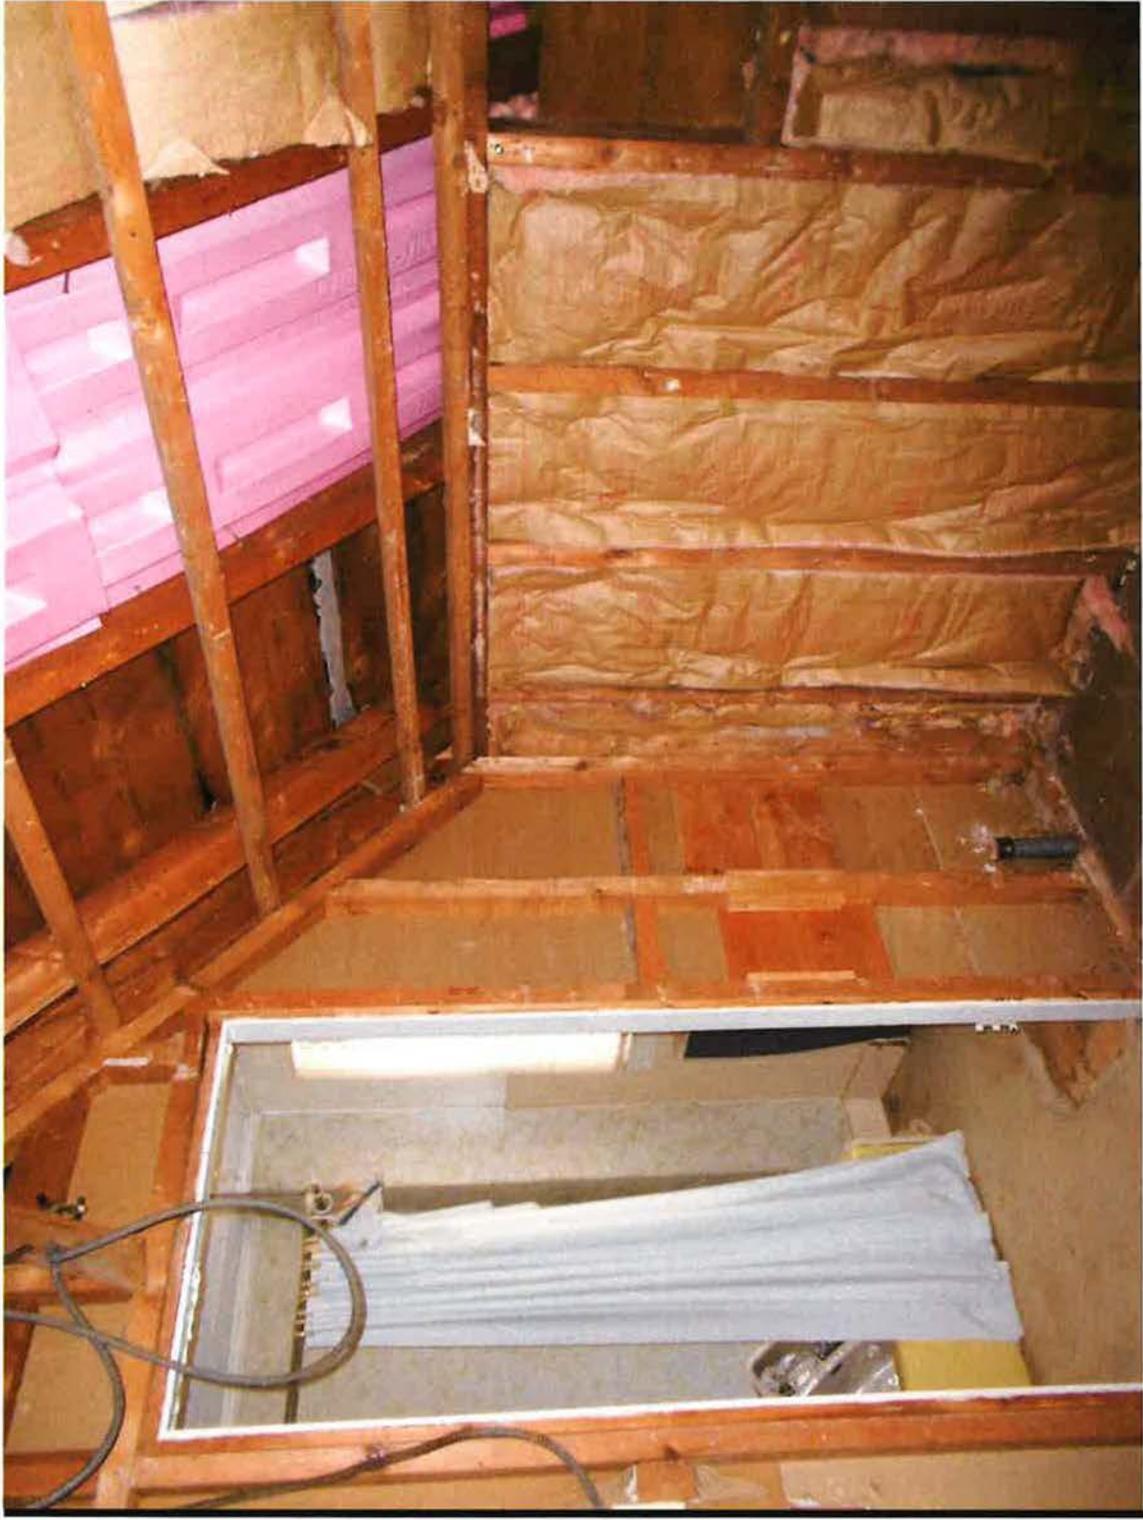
shows an open set of stairs through the floor making for hazardous conditions.
